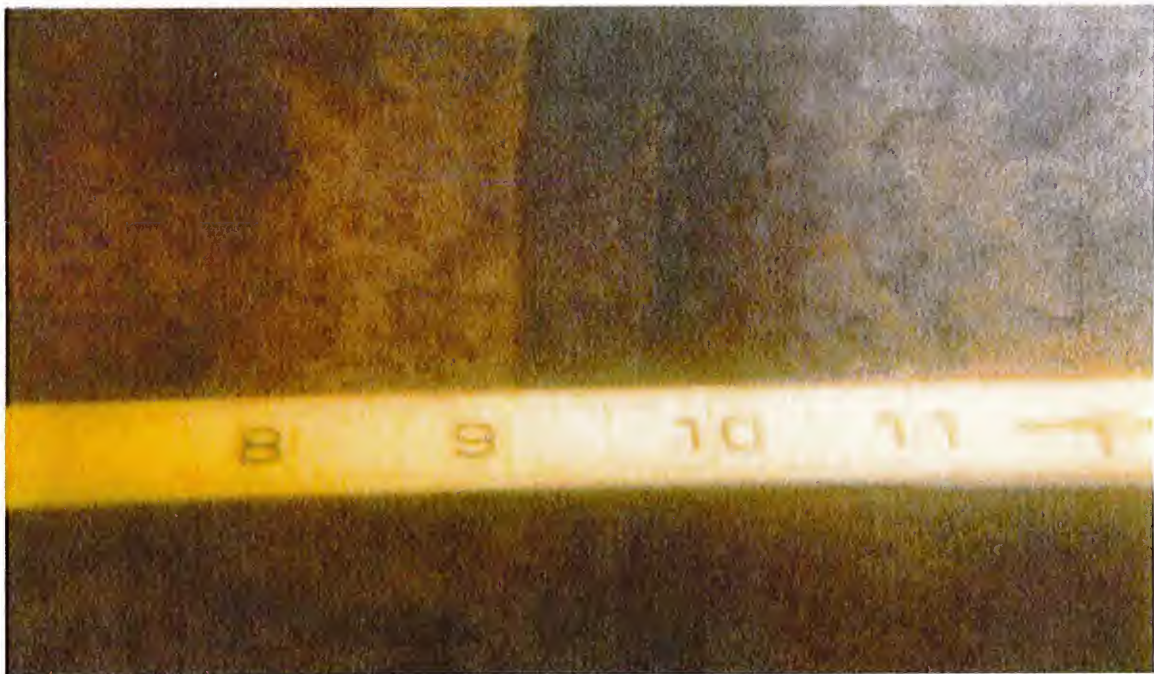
Severe concrete scaling at the waterline of Pier 3 (looking downstream)
